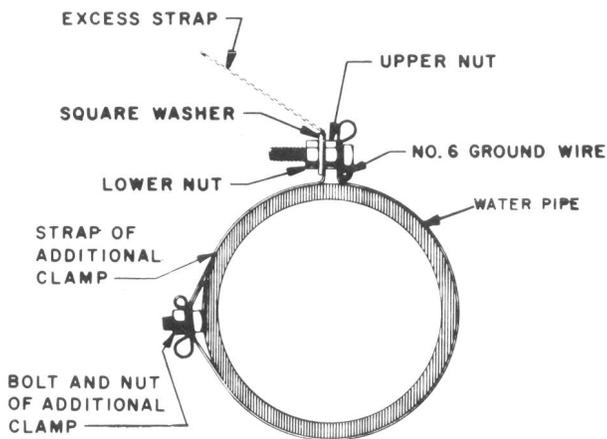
Attaching L Ground Clamp to Pipes Larger Than 3 Inches
